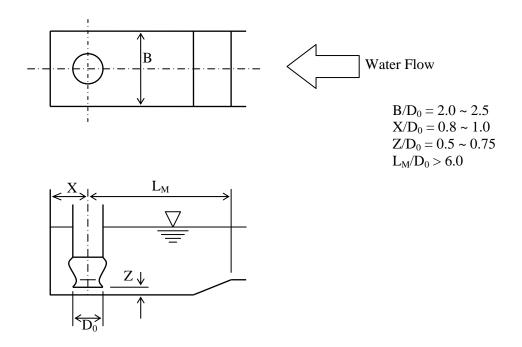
Standard Form and Dimension for Pump Pit
